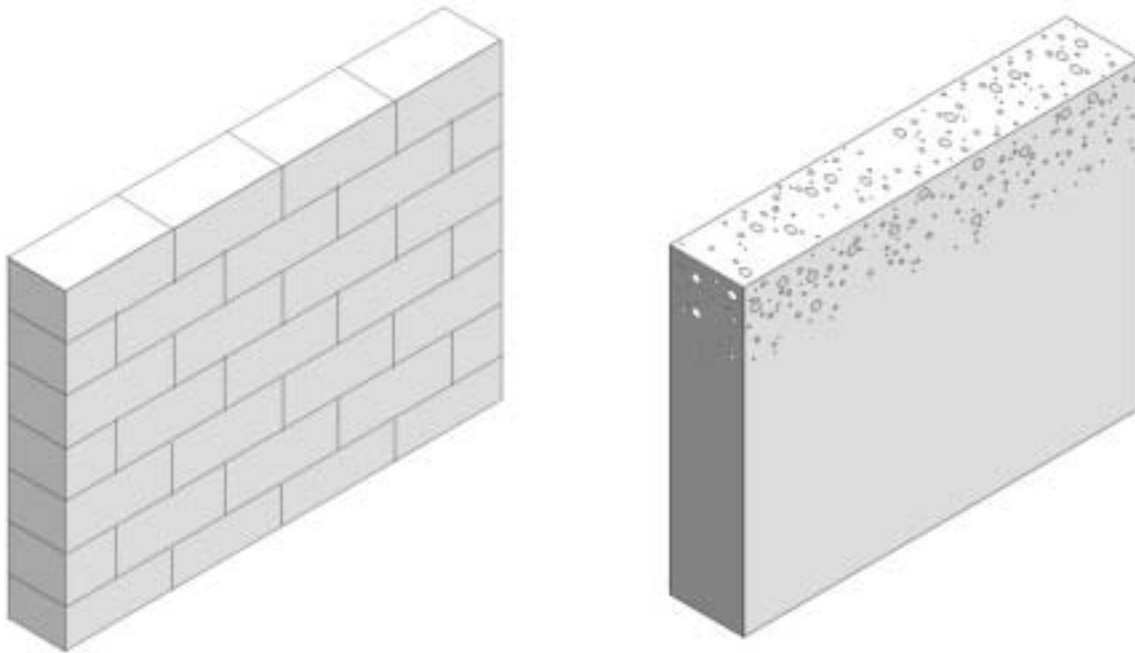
Solid Unit Masonry (left) and Solid Concrete (right) Walls
